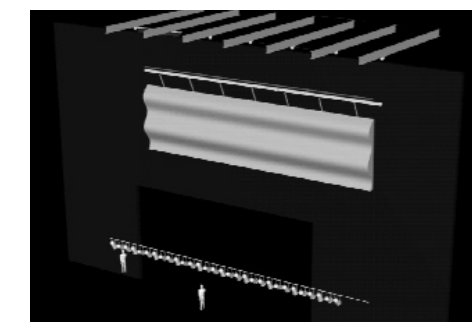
Vortek rigging of an Overture canopy element, showing canopy, hoist and structural I-beam connection.
